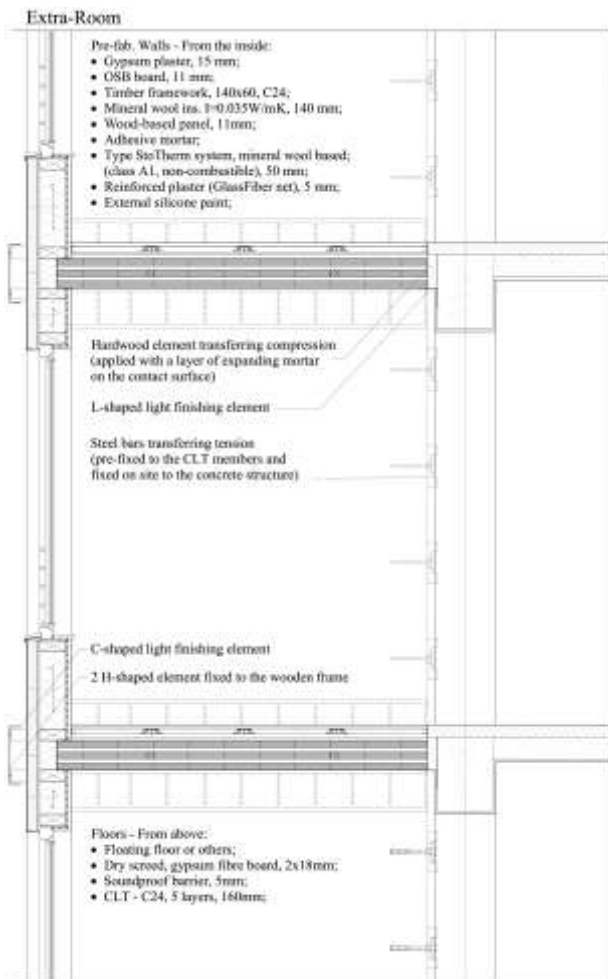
Detail of the extra-room architectural solution provided within the external CLT strengthening structure; the prefabricated timber-based walls, providing window frames are easily inserted in between the CLT slabs and fixed to the main structure from the front
